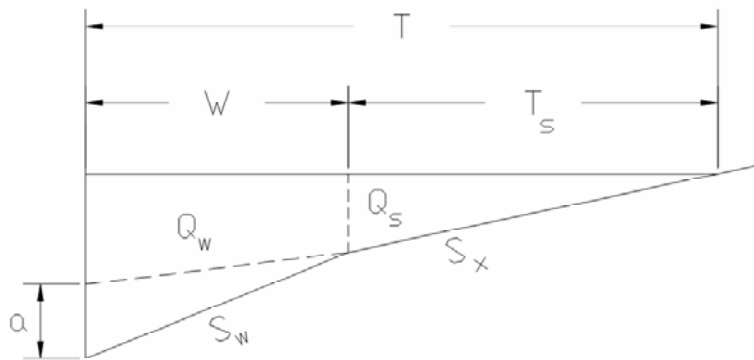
Typical gutter section with composite cross slope (UDFCD, 2008)
